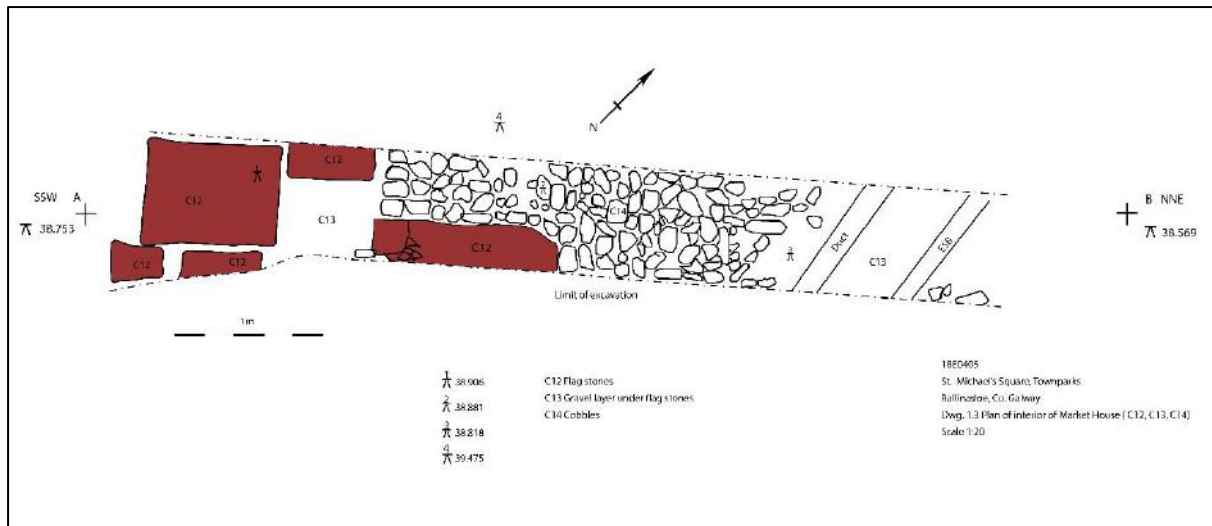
Plan of floor area from interior of Market House, Ballinasloe.
